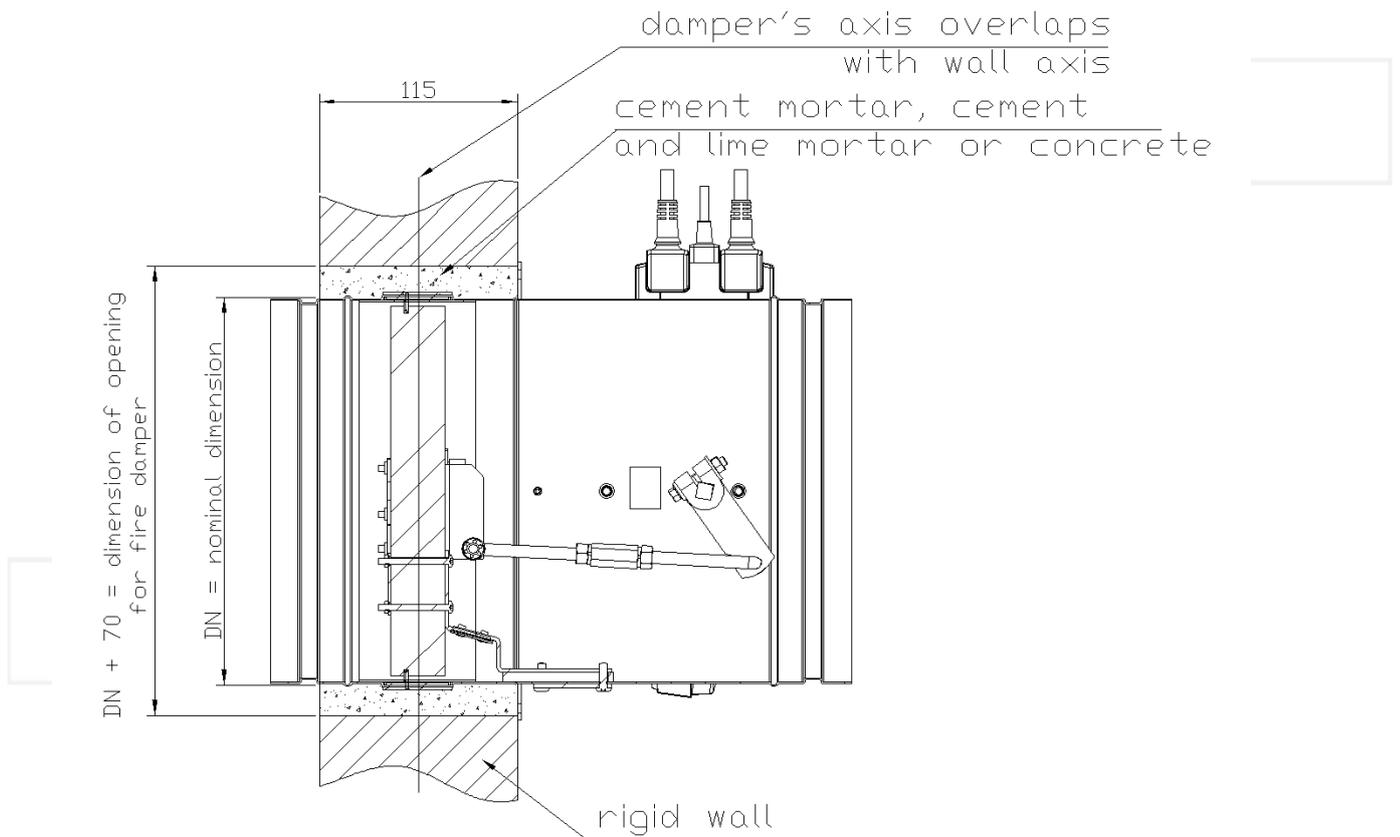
Installation of KTS-O in rigid wall construction with 115 [mm] wall thickness.
